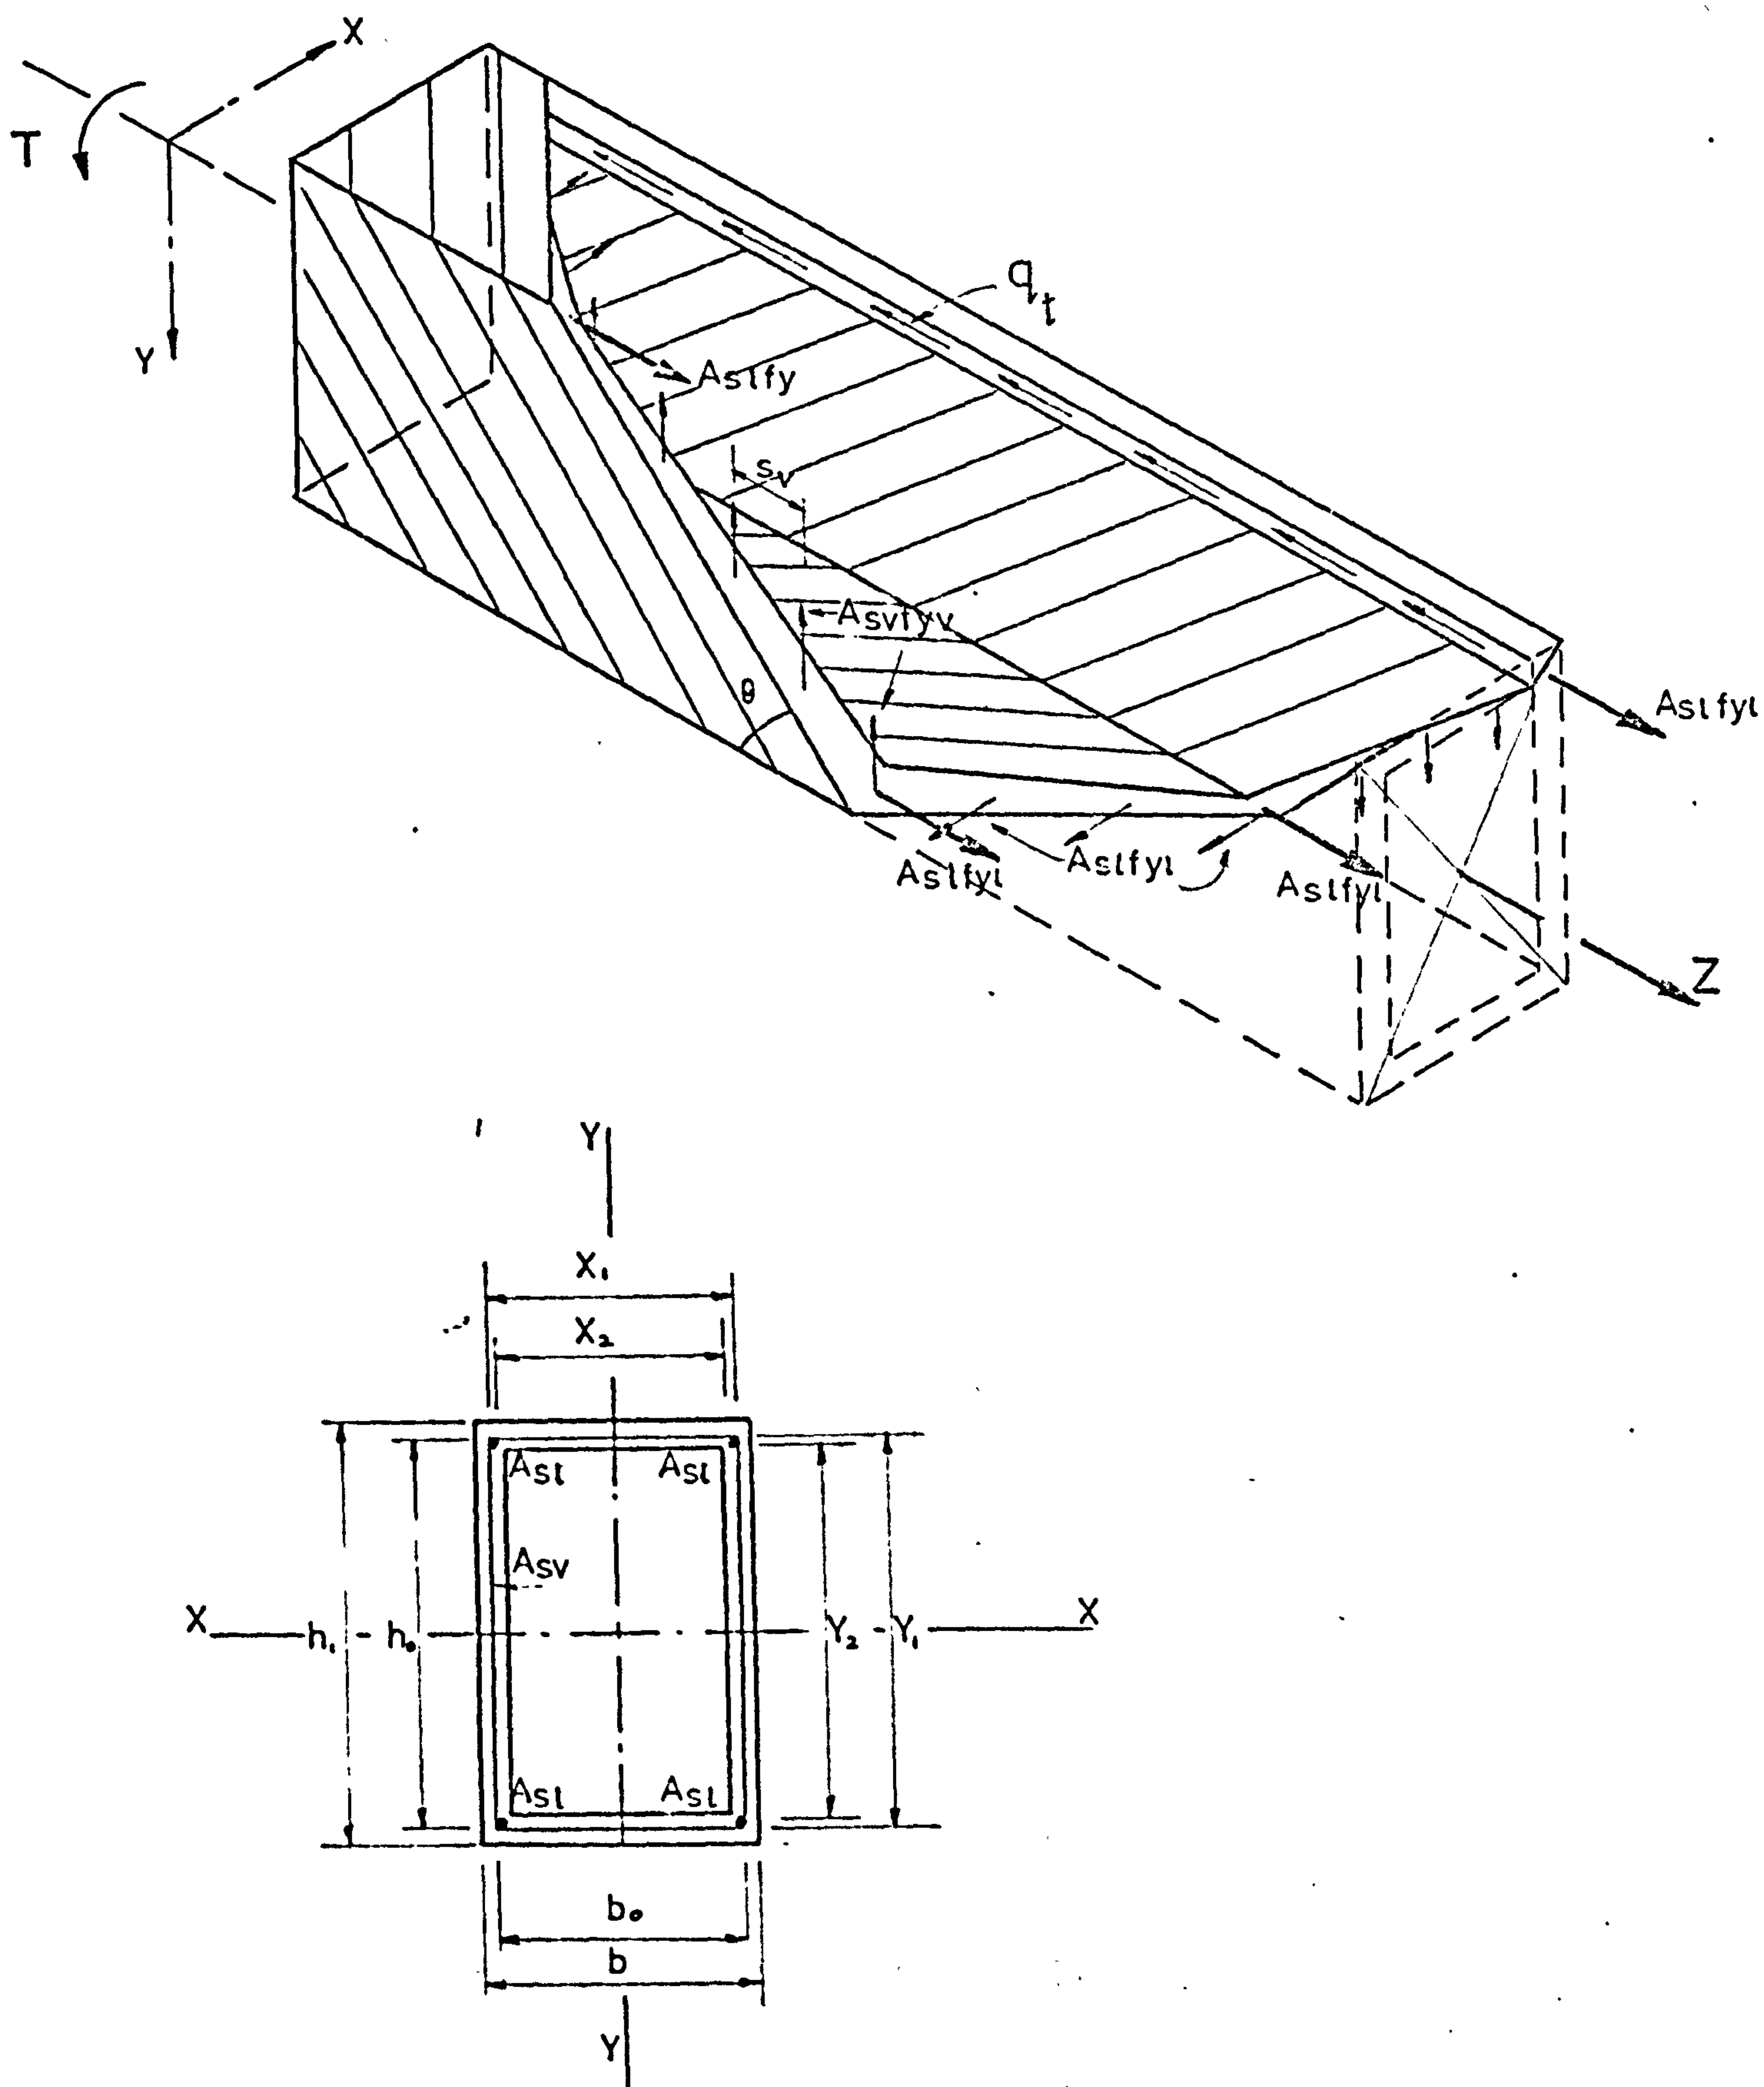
PROPOSED FAILURE SURFACE (METHOD A)
